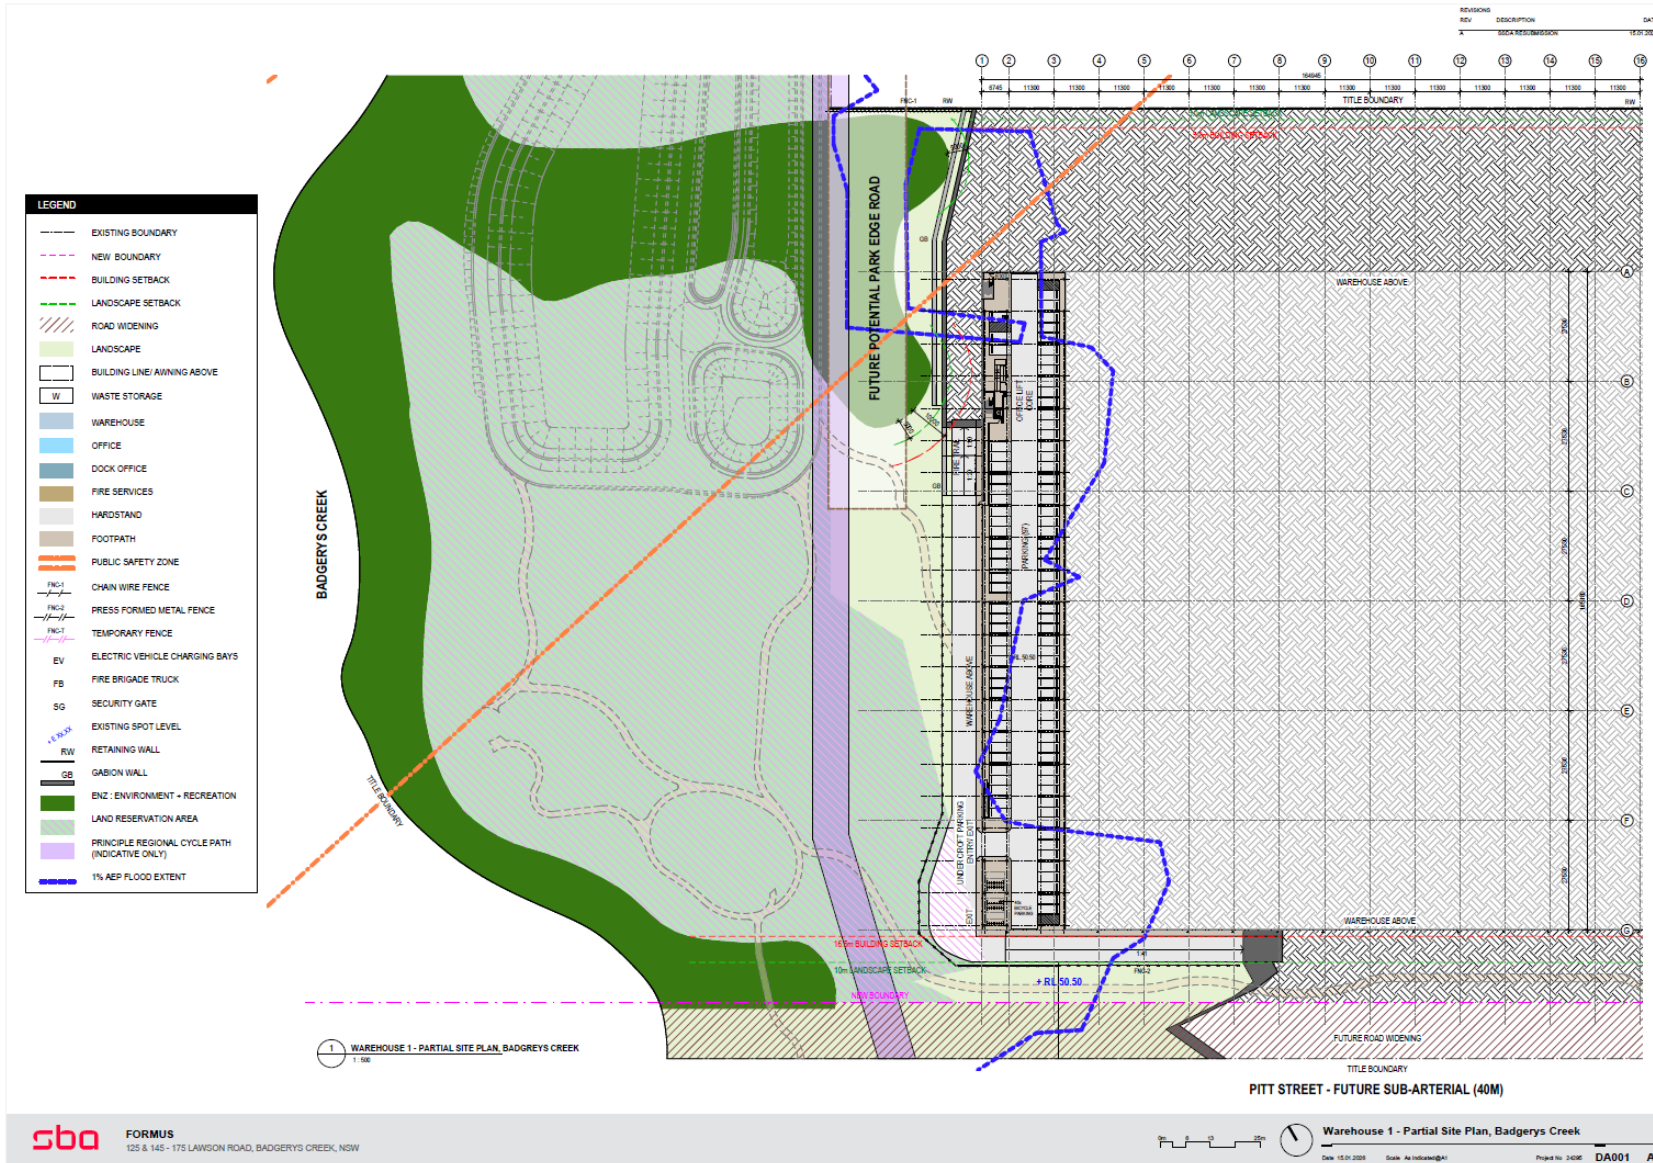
Extract of proposed architectural drawings, showing the partial site plan (western end).
